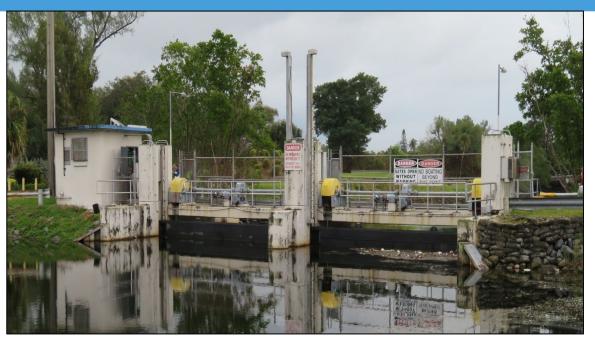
Structure (Looking Downstream) Source: 9/20/2023 SIP Report
